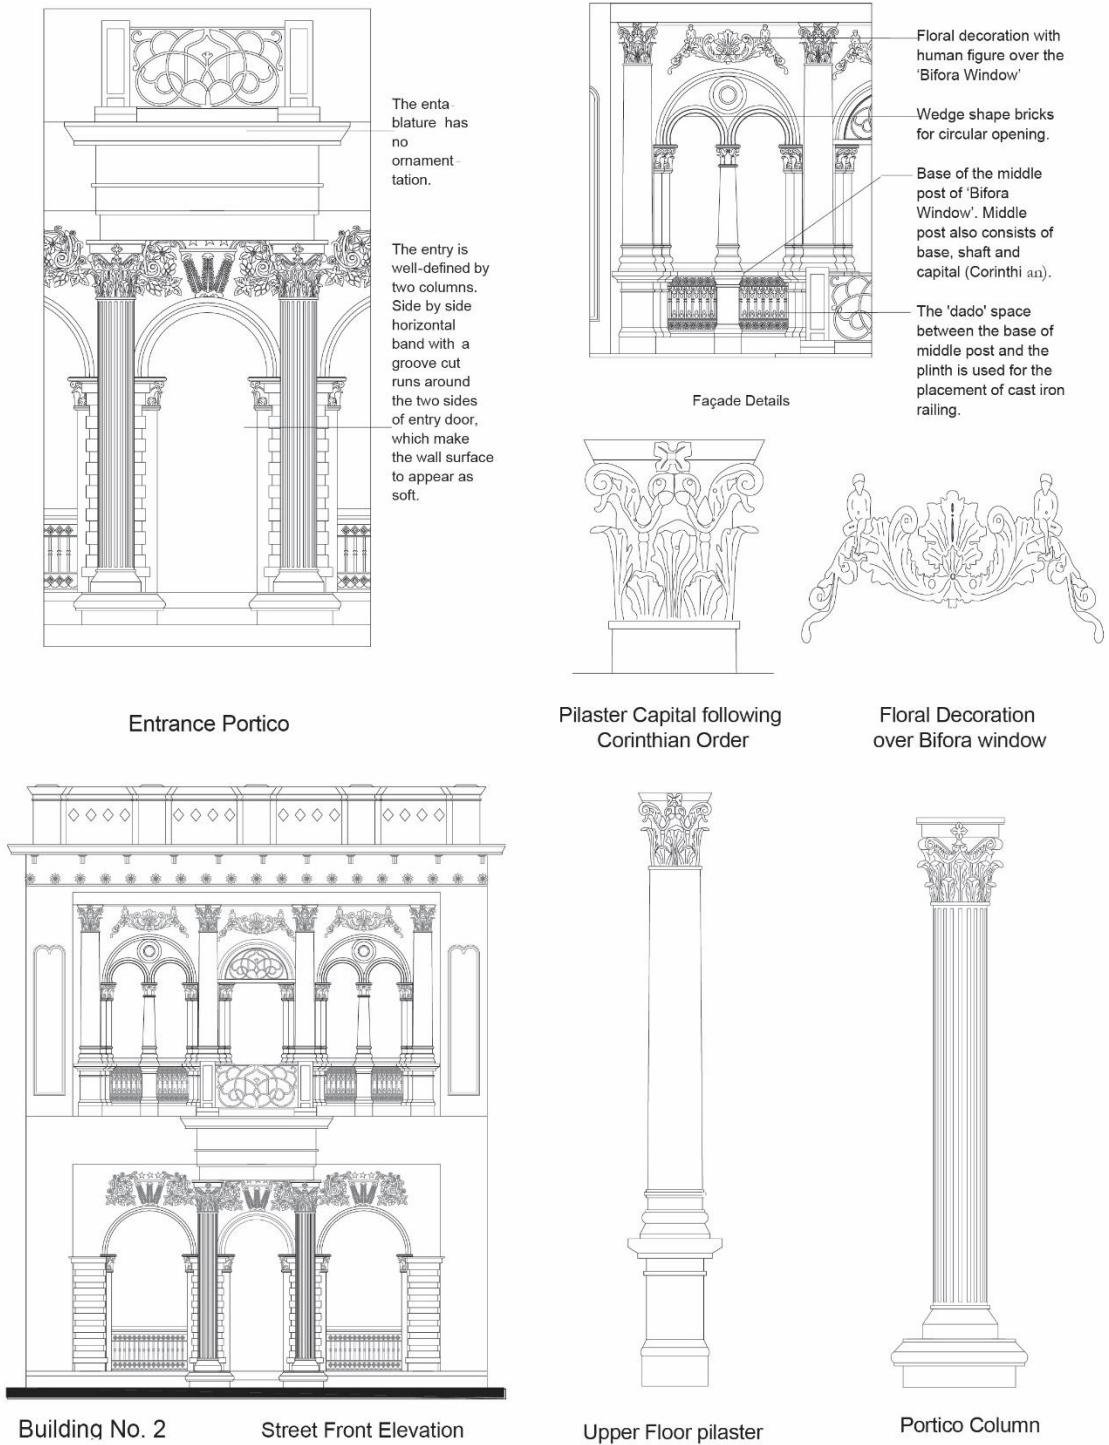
The features of colonial architecture in facades and building elements of the building number 02 at Panam Nagar, (Source - Shaikh, 2009)
